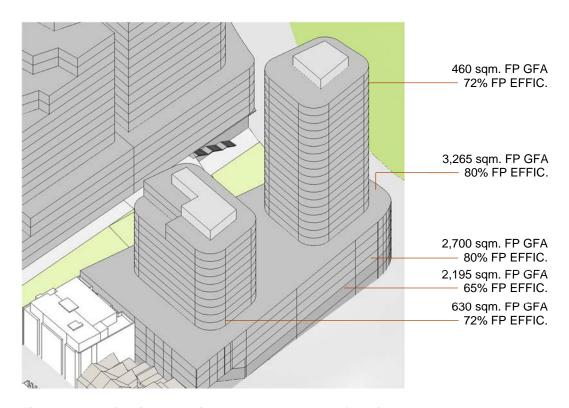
aerial view showing proposed controls for mixed use development at 1-27 Murray Street
